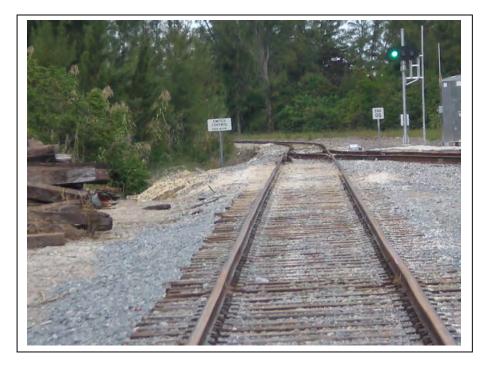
December 5, 2008 ROW126 ft from overhead bridge looking North
